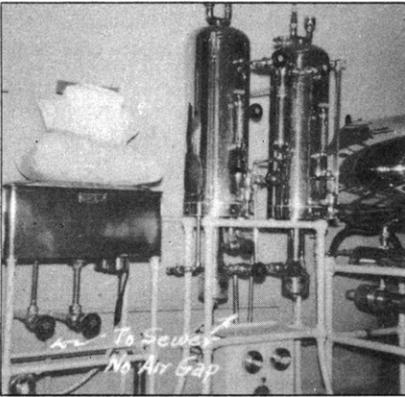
Unbroken connections on drains for sterilization equipment at a hospital.
